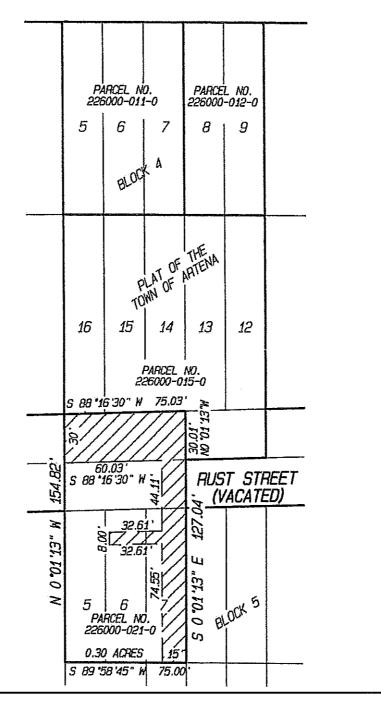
STORM DRAINAGE EASEMENT DRAWING
